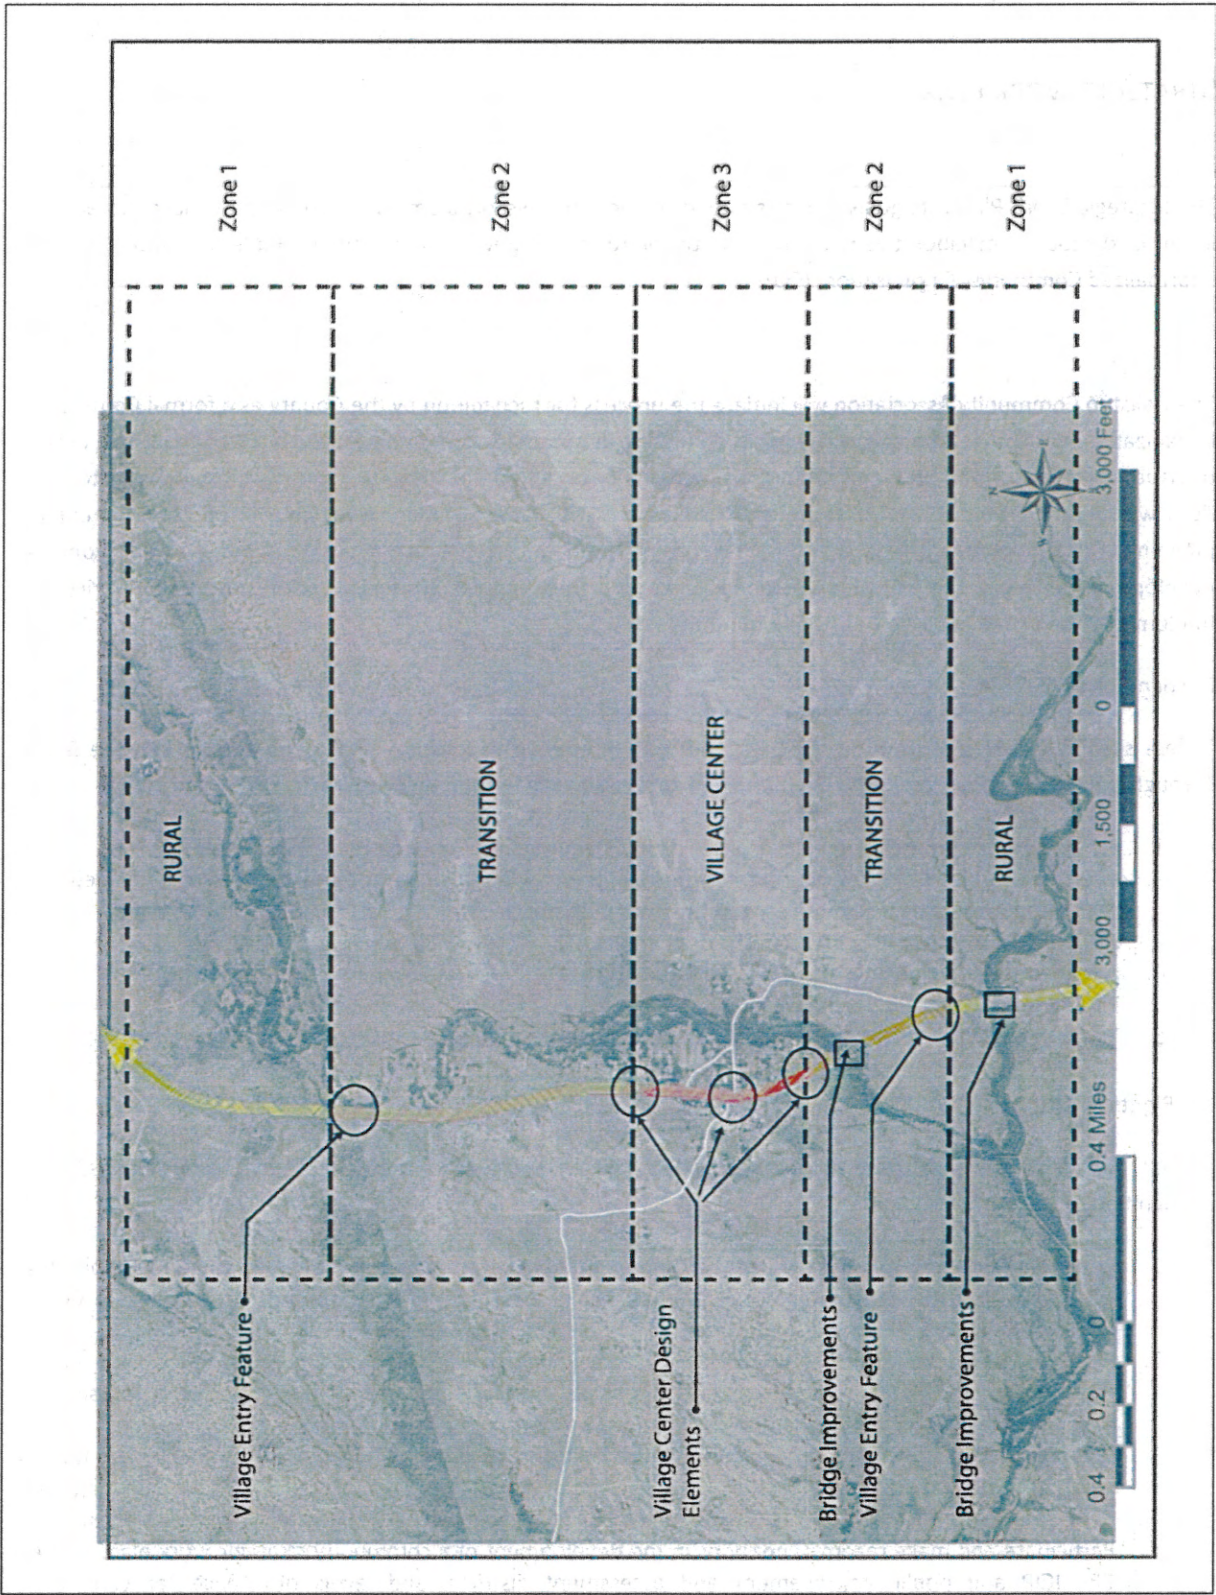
NM 41 ROAD CONCEPT PLAN
